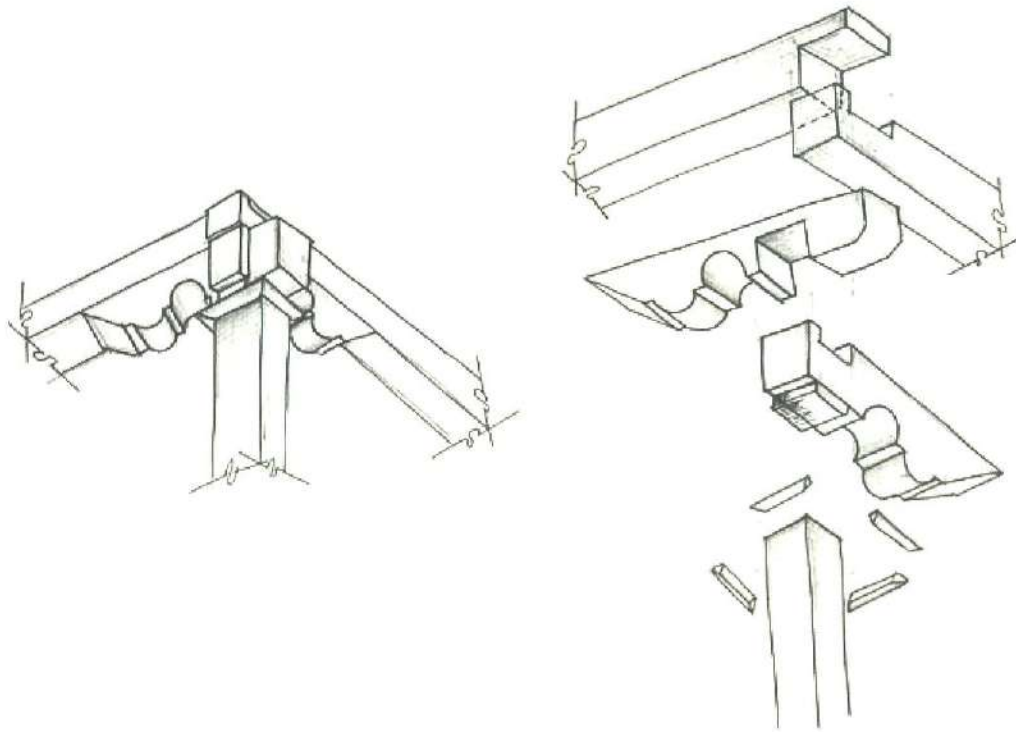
Appearance (left), and method of connection of a column and crossing beams
